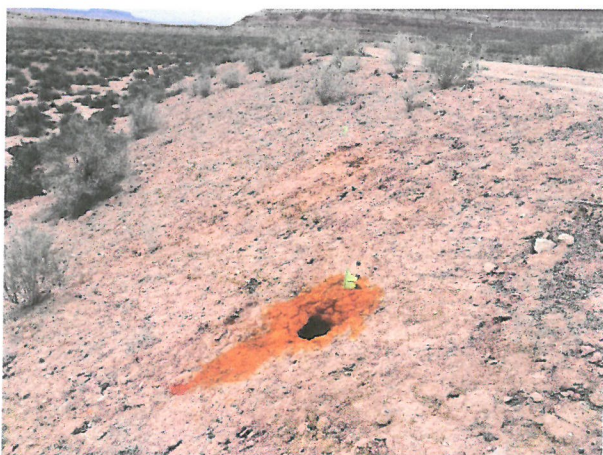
A4-8 – T-11 location: Looking northwest. A transverse crack can be observed in the northwest wall and a 3 inch hole intersecting the crack and running longitudinally in a northeasterly direction along the dam.
